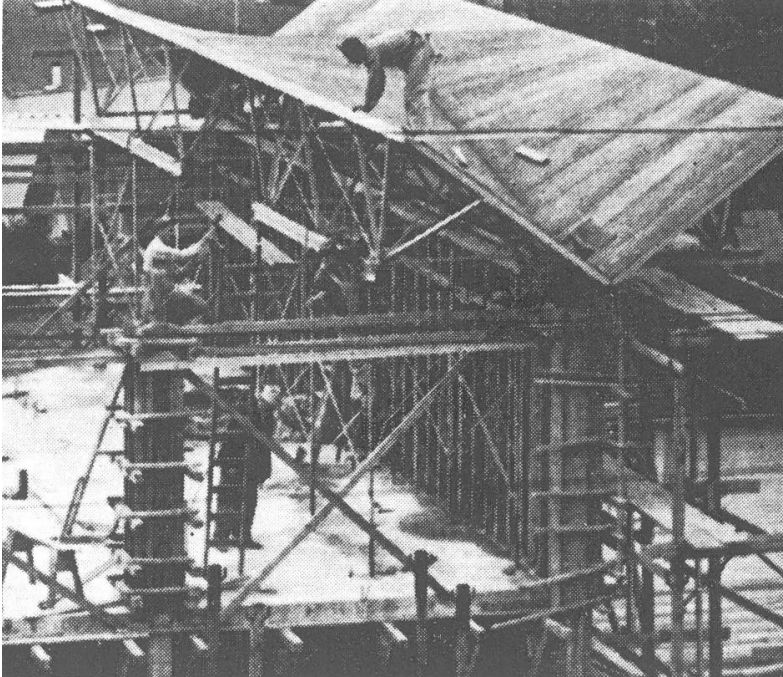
Construction Photo - *Pacific Architect & Builder* – “PA&B Progress Report,” 7/1960
